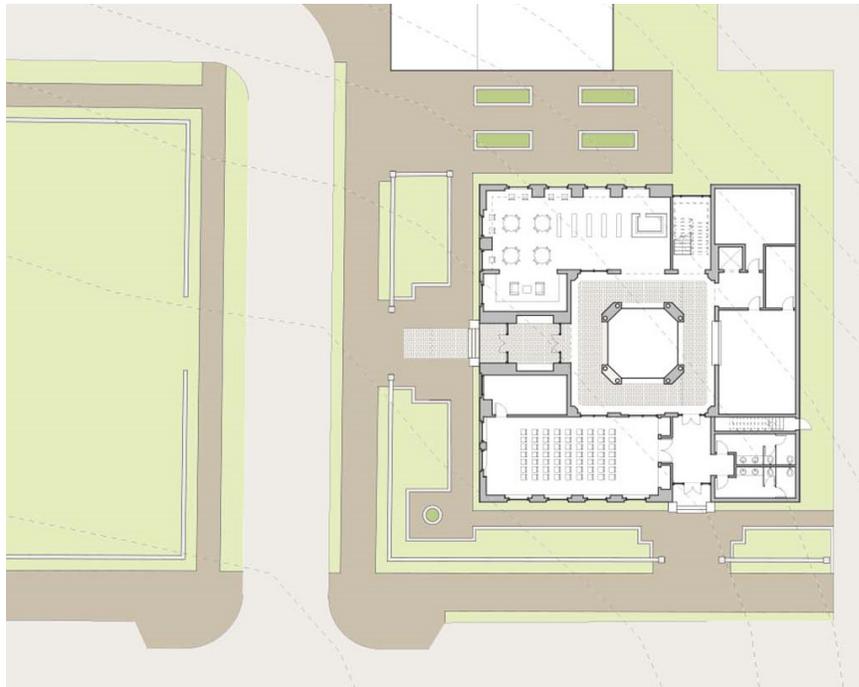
Cumberland, MD – First Floor Plan, Source- Author, 2014
